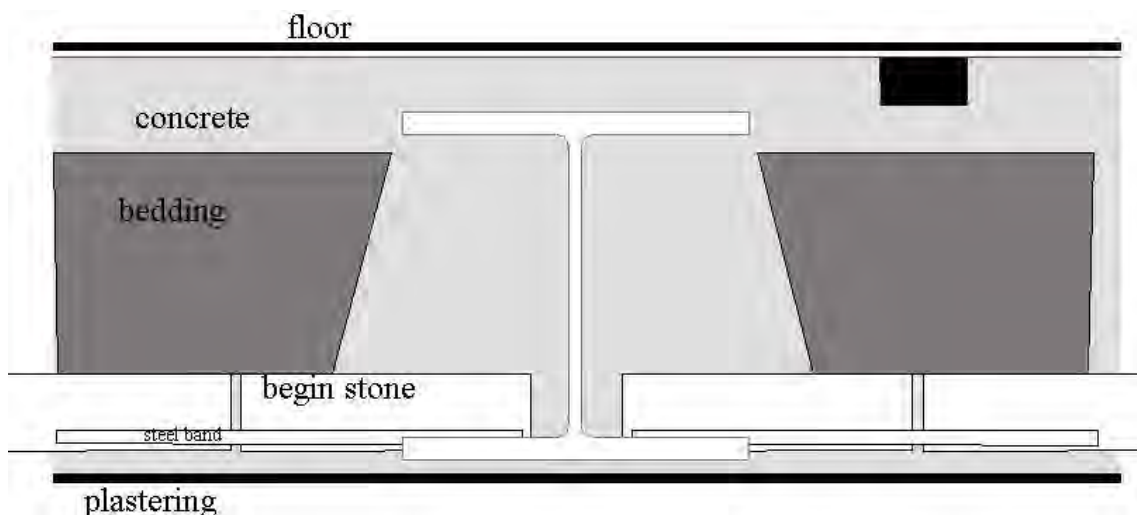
Critical structural floor detail ("Kleine" floor)
